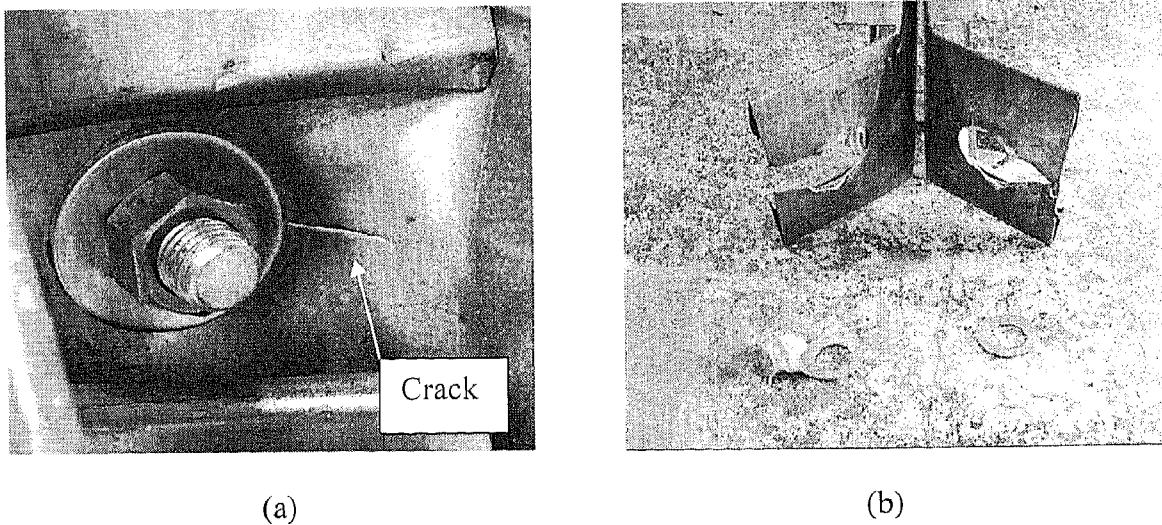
Connection Failure (a) Crack Propagating (b) Bearing Failure
